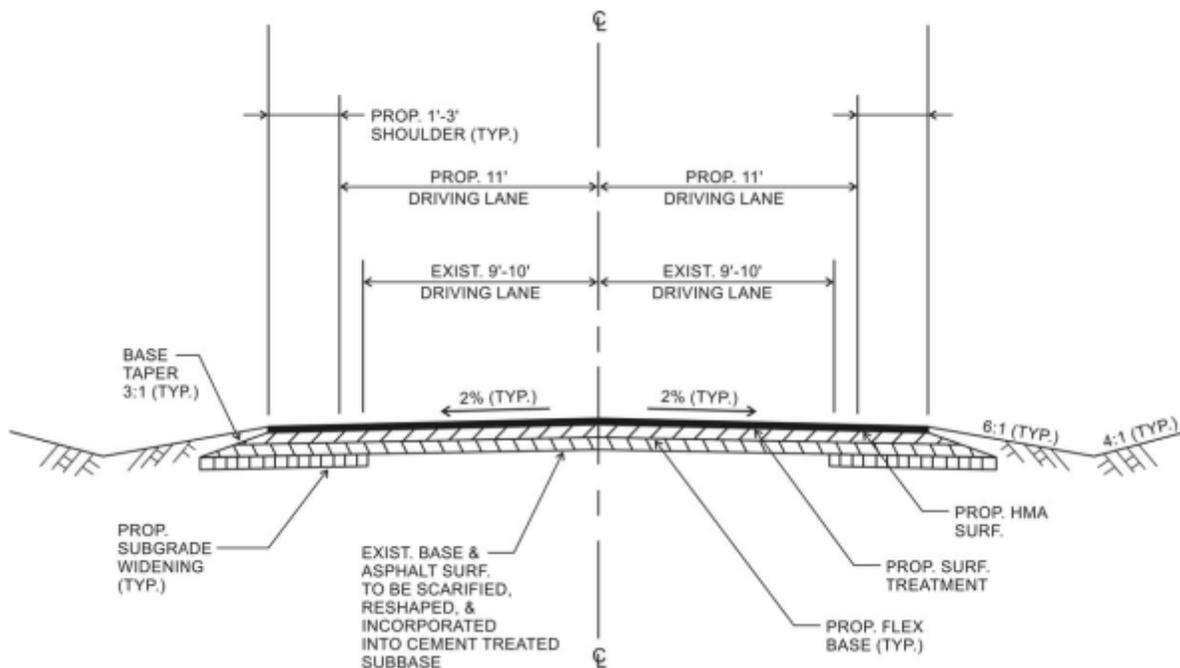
Widening flexible pavements in poor condition using full depth recycling.
